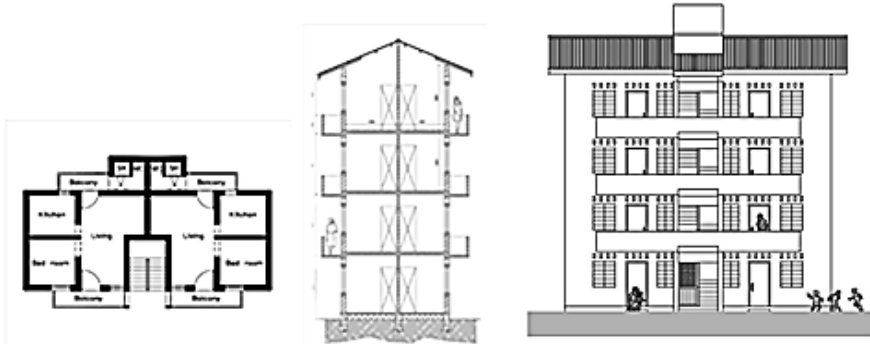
Housing/building types; Typical floor plan; Single & two bedroom/ 4-unit plan, section, elevation
